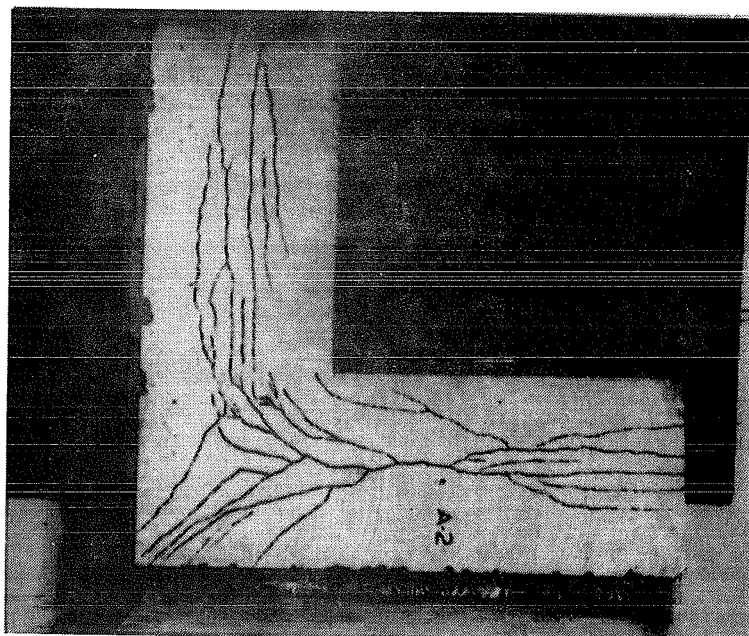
Crack Patterns for Islam's L - Shaped
